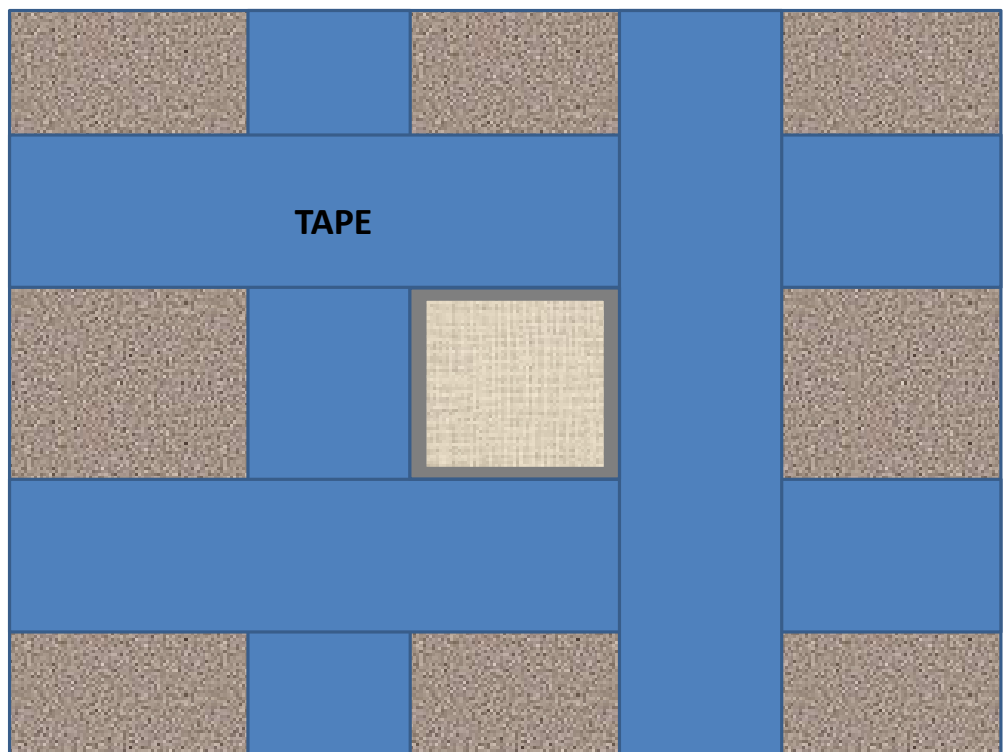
Remove Flake Layer on Edge Down to Base Color Layer
